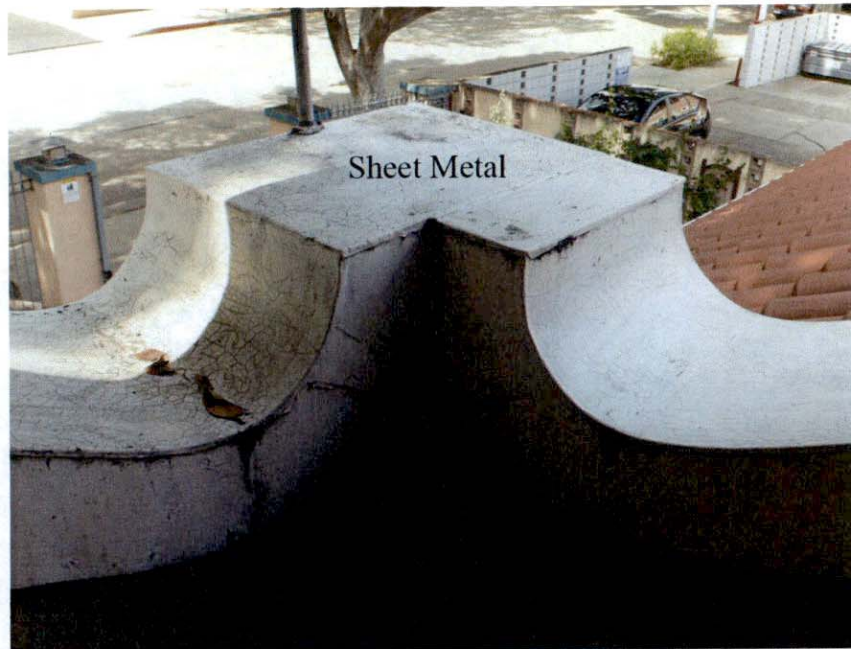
Looking east at the sheet metal roofing imitating a red clay tile roof, primary west elevation.
